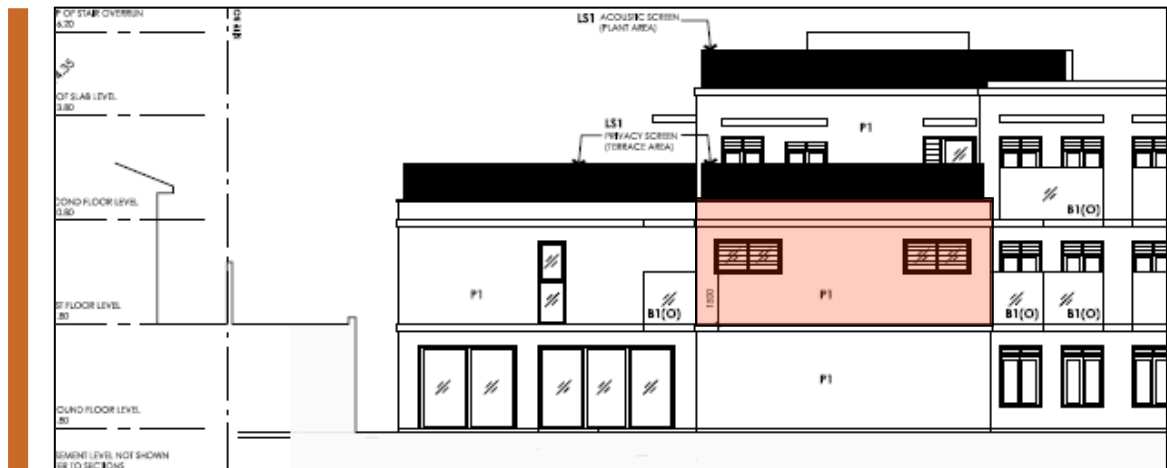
Floor space the subject of condition C.1(j) - east elevation
